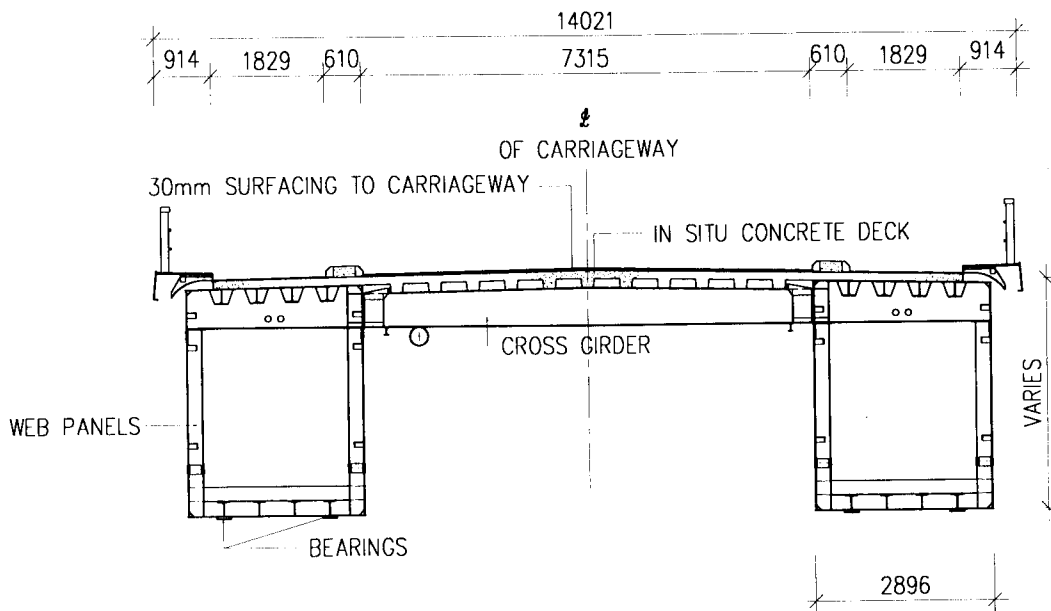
b. Ahmad Shah Bridge – Typical Cross-section
